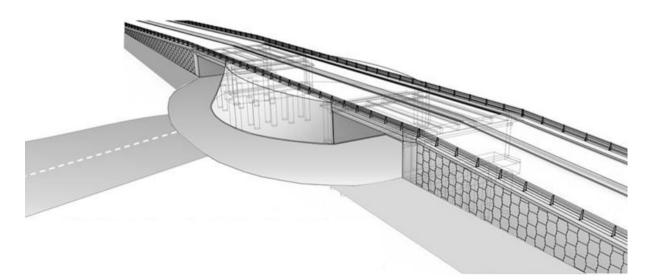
Typical Cross Section of a Duplex Type Structure
